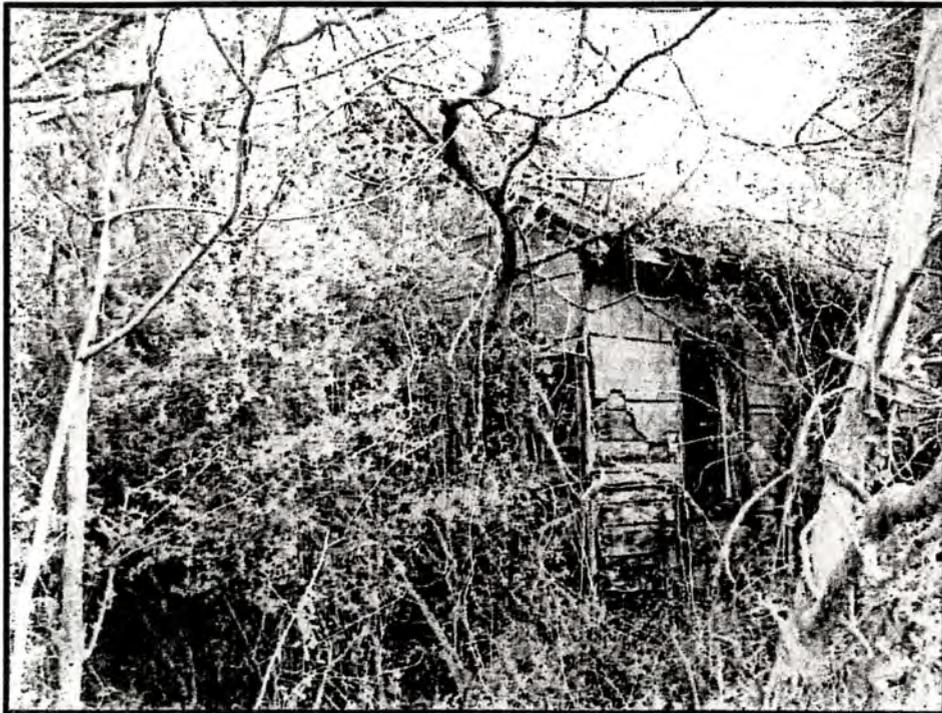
South end of Addition (kitchen) off of south side of house, facing north.
